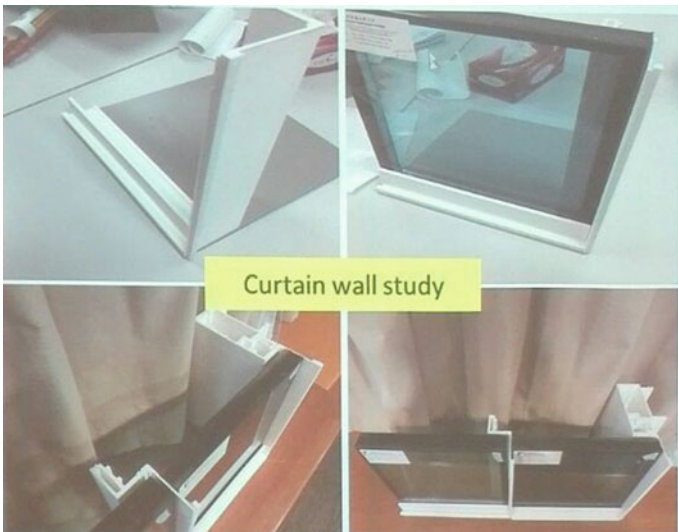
Curtain wall additive manufacturing model (author's photo)
